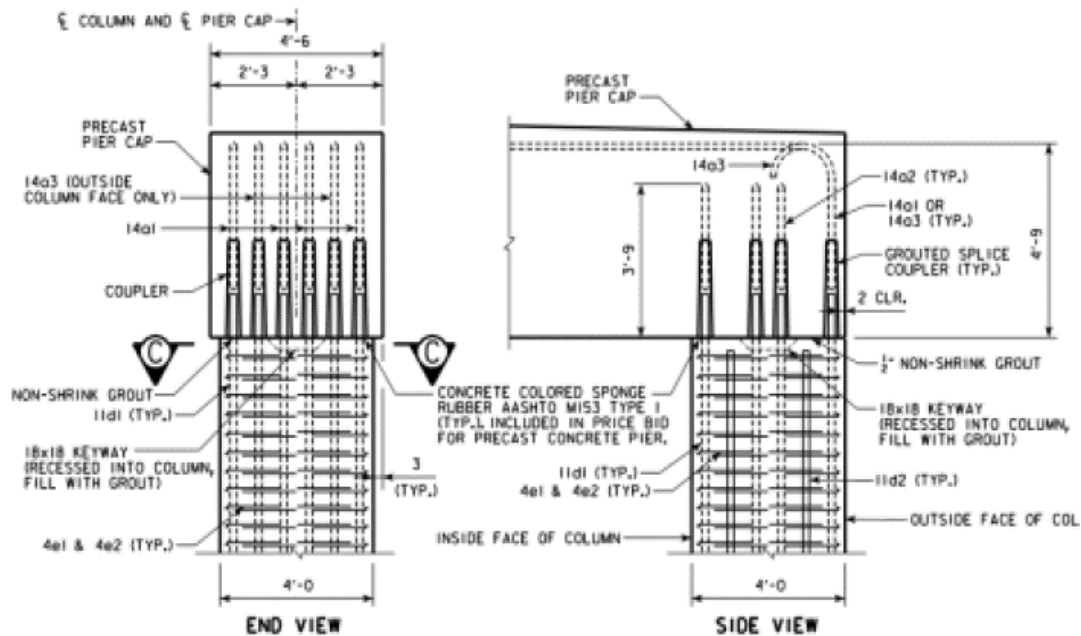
Precast column-to-cap beam connection in Keg Creek Bridge (Littleton 2013)
